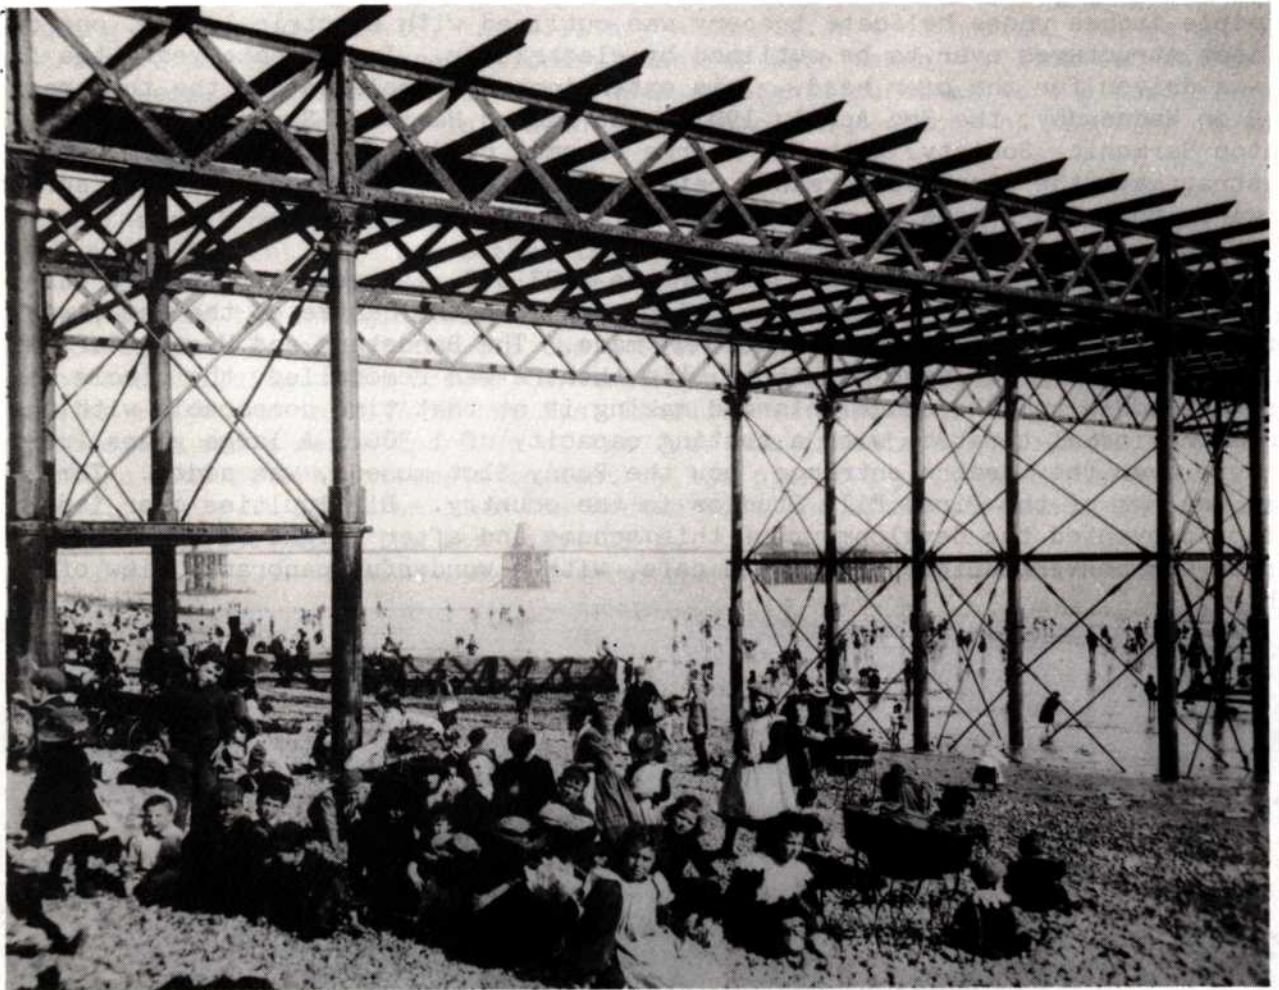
Construction of Palace Pier with Chain Pier in background. c1895-6
